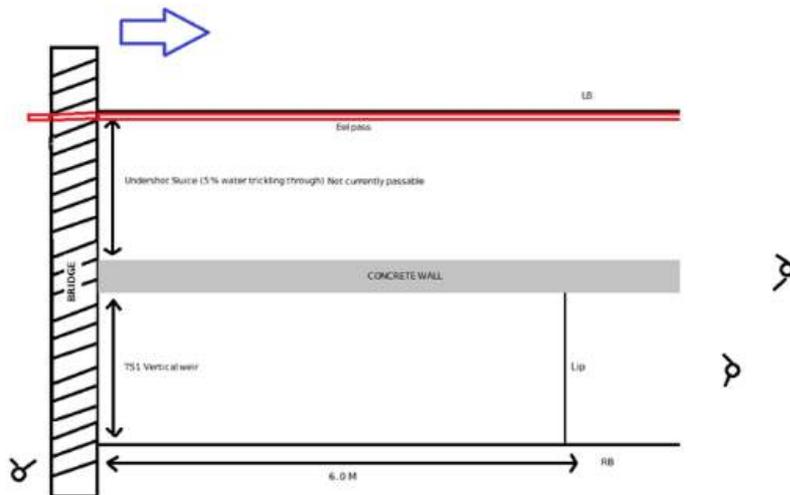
Site plan for Kids Mill Sluice
